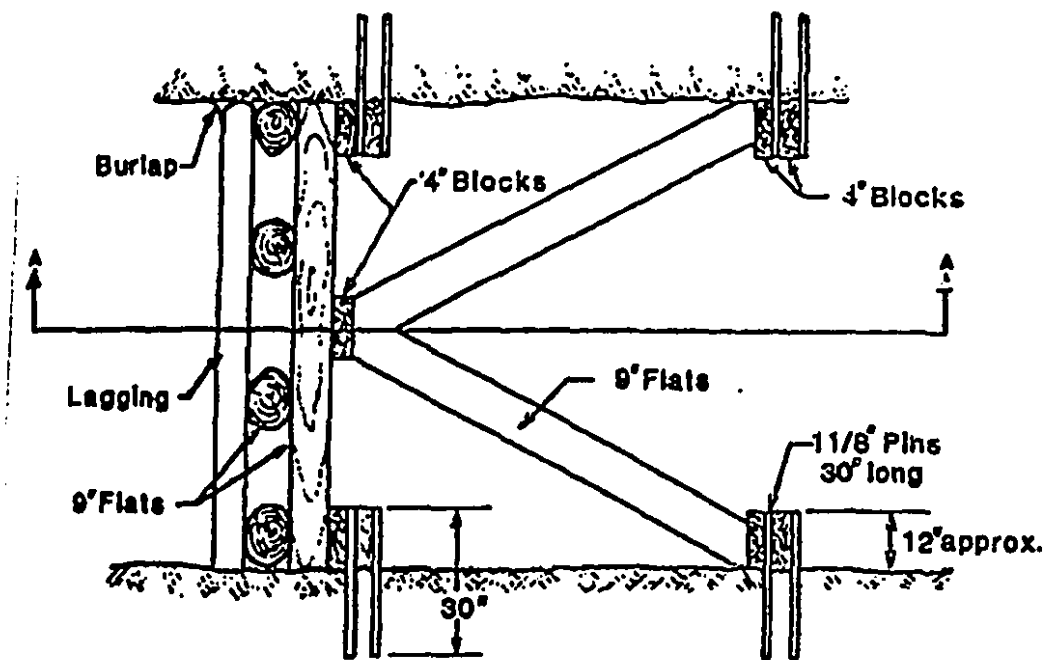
Bulkhead bracing system in Falconbridge nickel mines.
